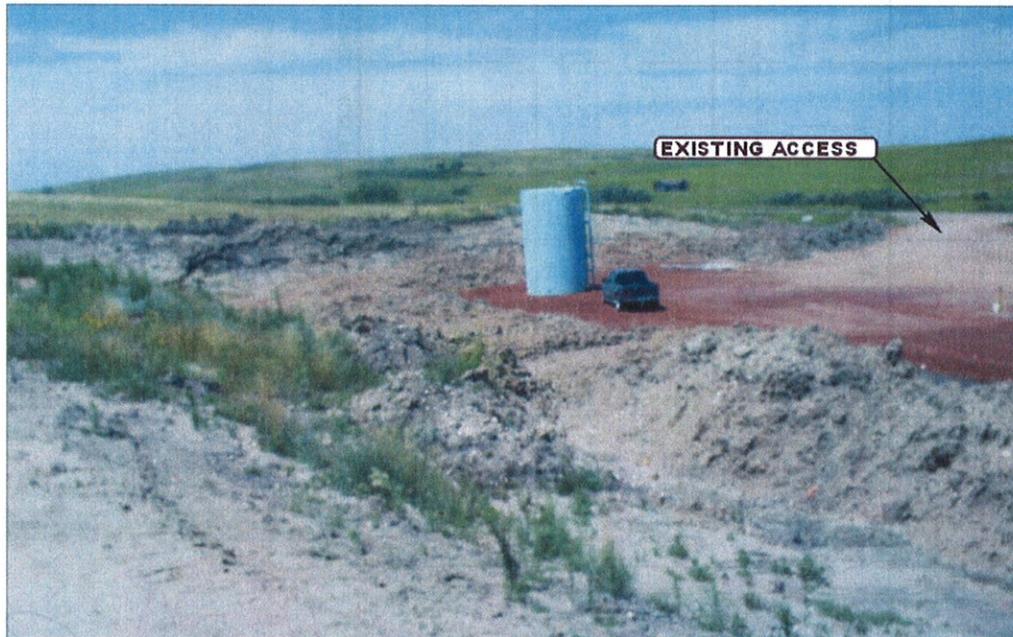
PHOTO: VIEW FROM SOUTHEAST CORNER OF EXISTING PAD
